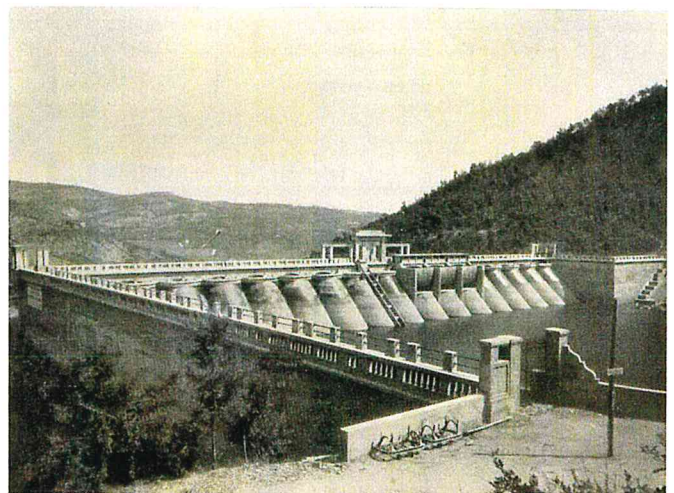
Upstream view of the dam showing the 17 reinforced concrete arches and the left gravity shoulder
